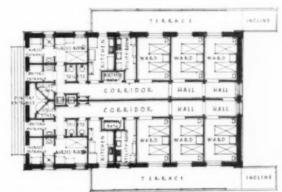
Samaritan Hospital—Contagious ward building. First floor plan.
